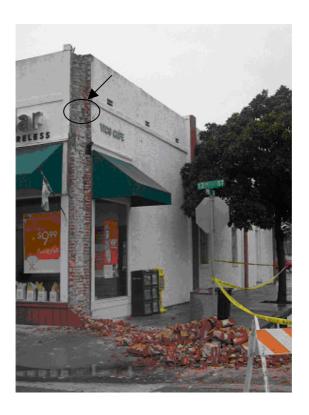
Minor structural damage to brick façade of Cingular Wireless building at the corner of $13^{\rm th}$ and Pine Streets, Paso Robles - Major damage was averted due to the seismic retrofit anchors strengthening the connection between the roof and the walls (circled above)
